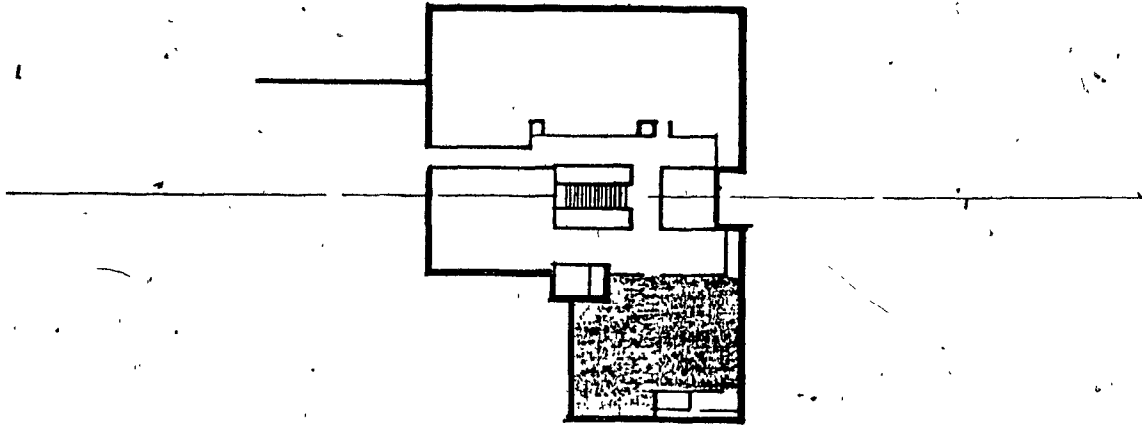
Fourth floor plan, Gallery D, documented, shaded
